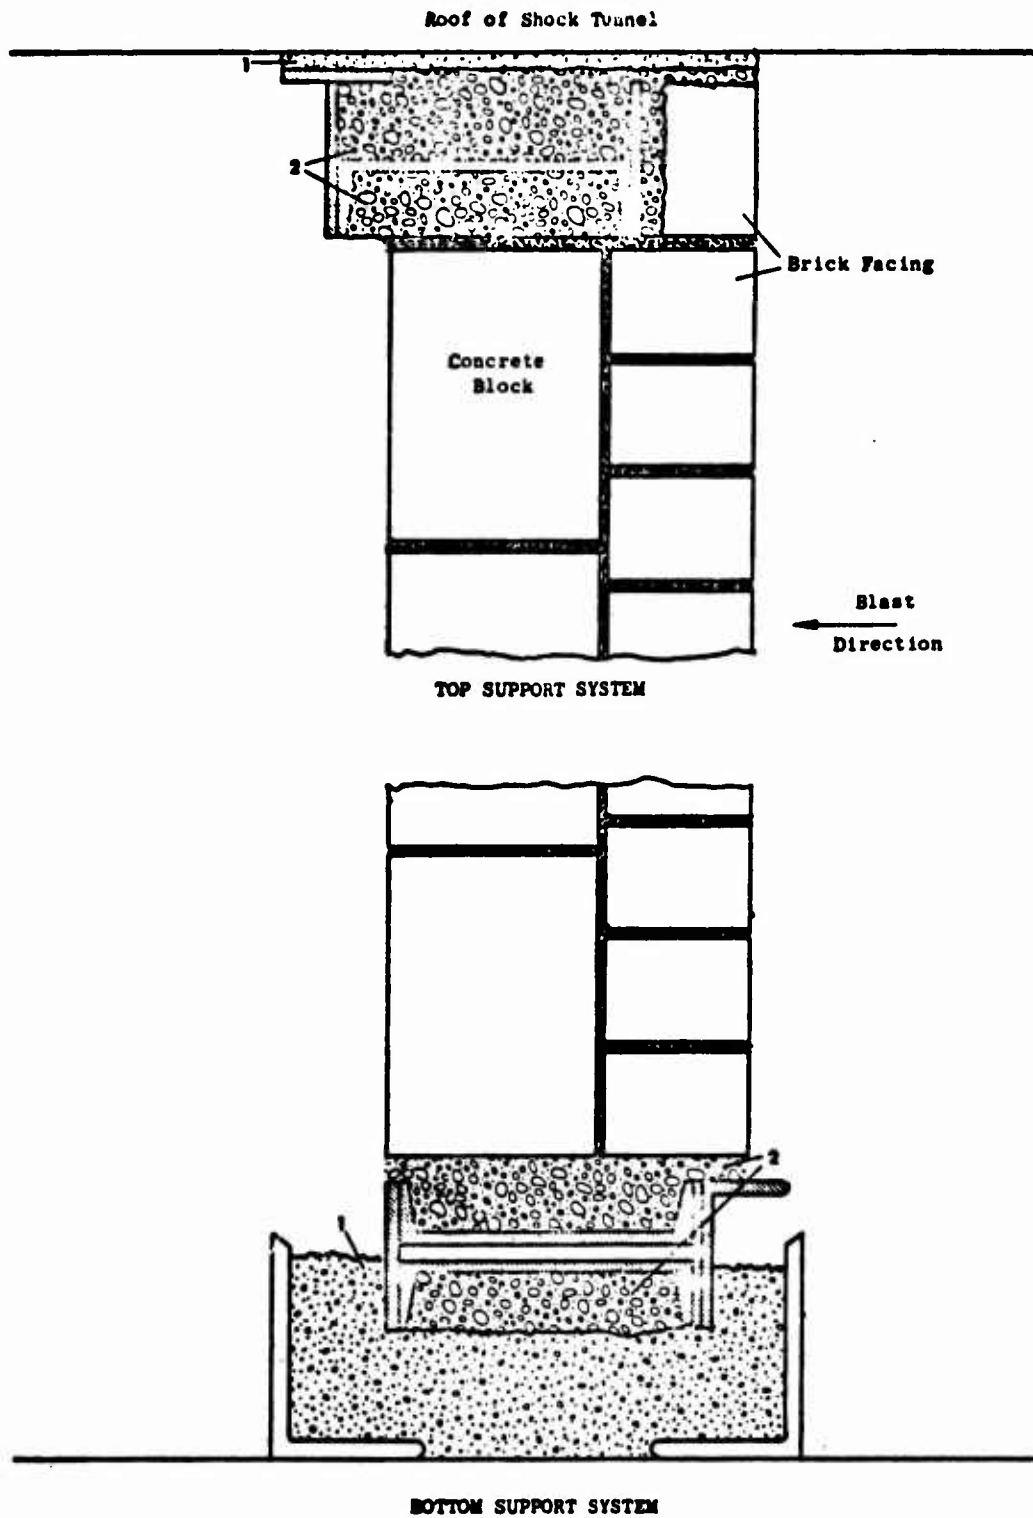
Support Systems for Wall 92, 6-in. Concrete Block with 1-in. Brick Facing. Note: 1. Mortar installed when wall placed in Shock Tunnel. 2. Mortar installed when wall was constructed.
